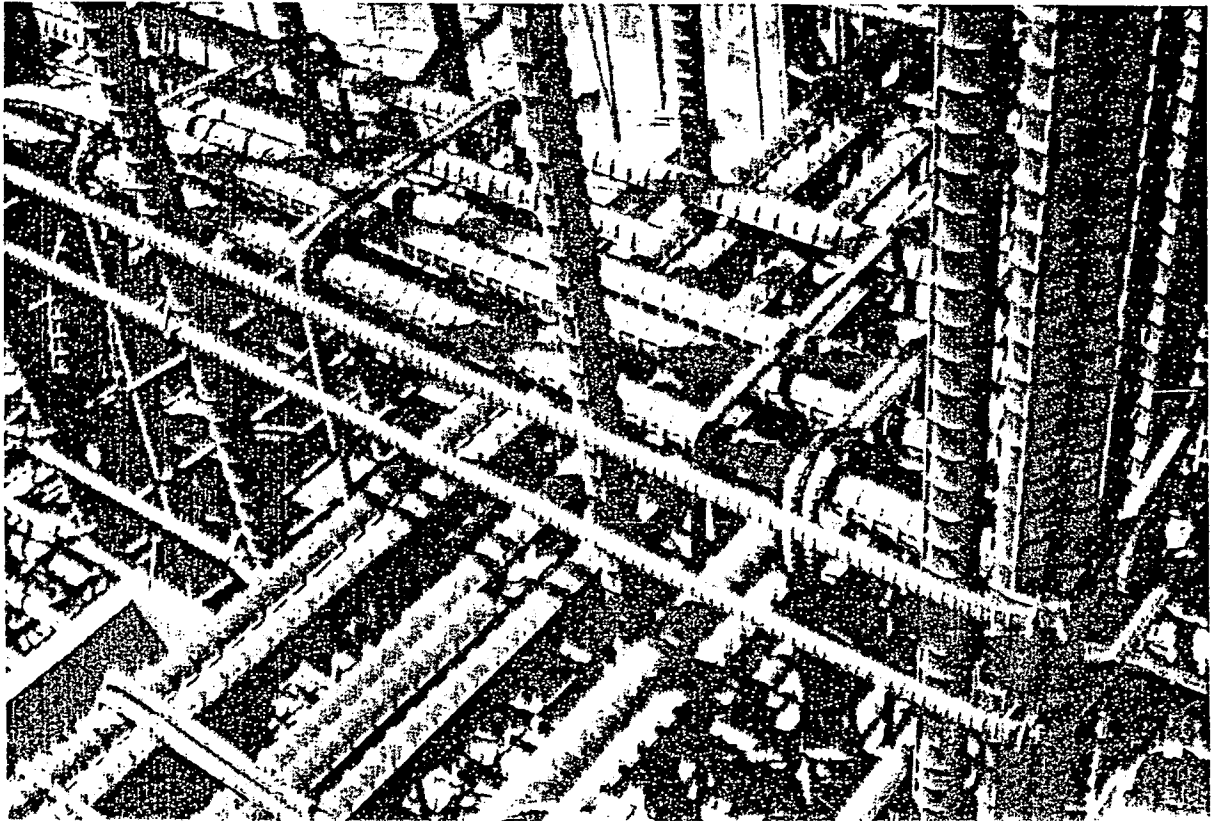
Joint reinforcement arrangement for ductile reinforced concrete
